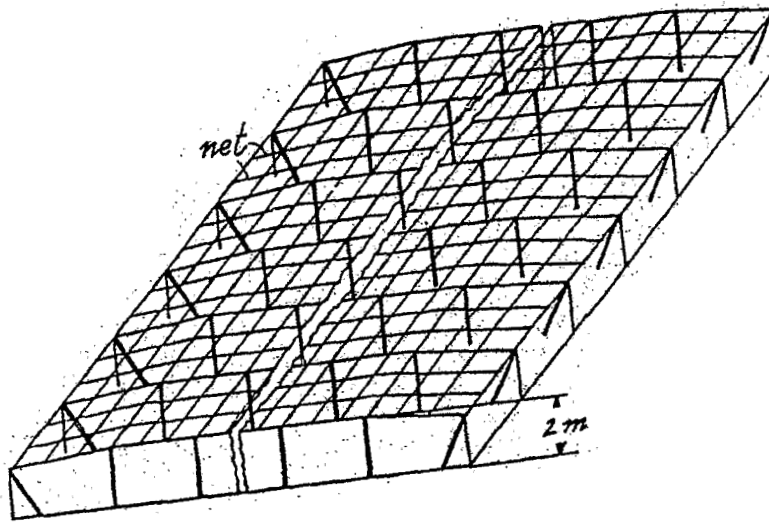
Parral type greenhouse in Almeria, Spain (FAO book)
